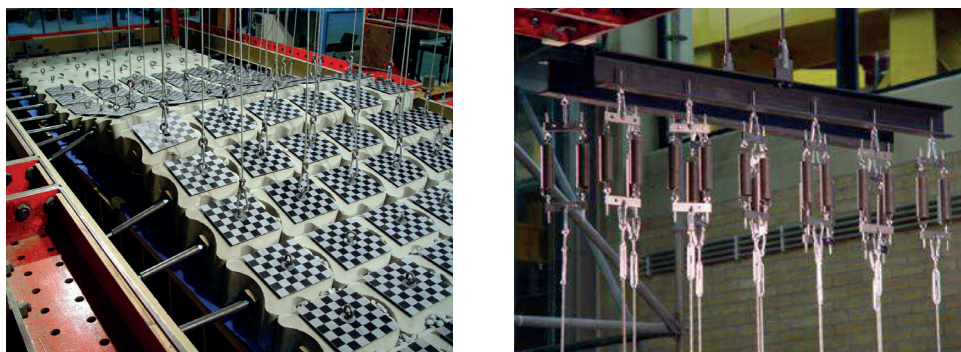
Test execution with (left) deformed shape and stereo-metric markers and (right) load distribution beams and springs
